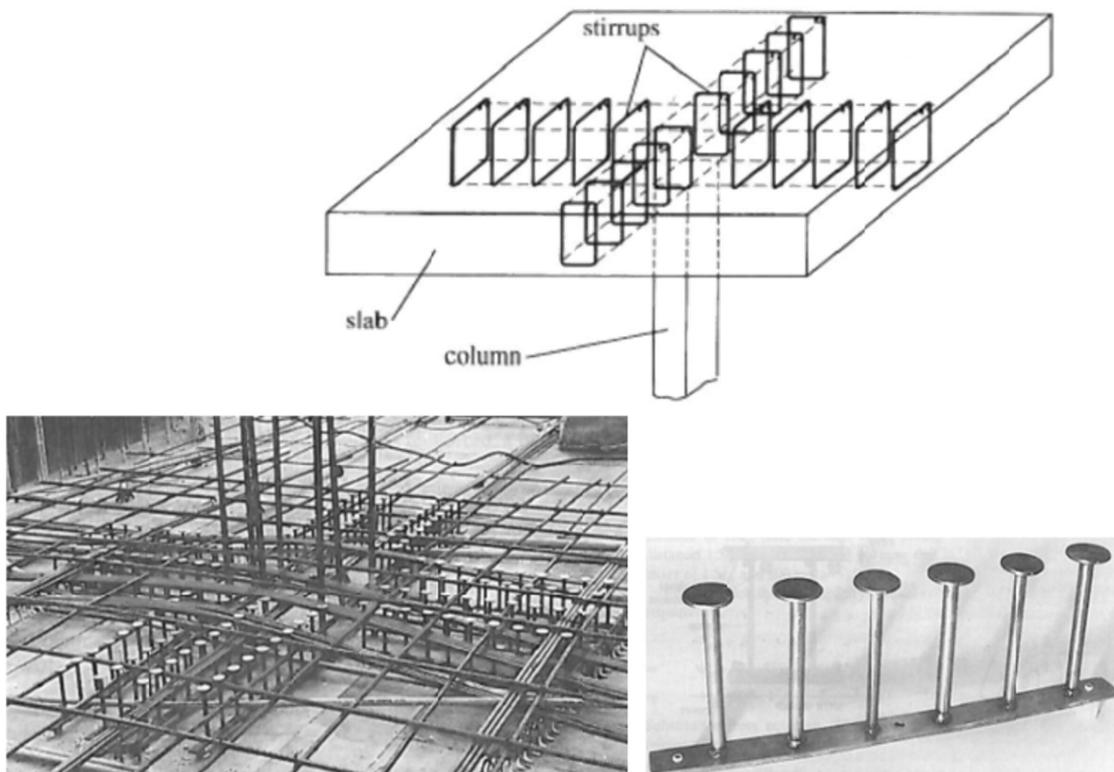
Punching shear reinforcement (a) shear studs in place around a column, (b) shear studs attached to base plate.
